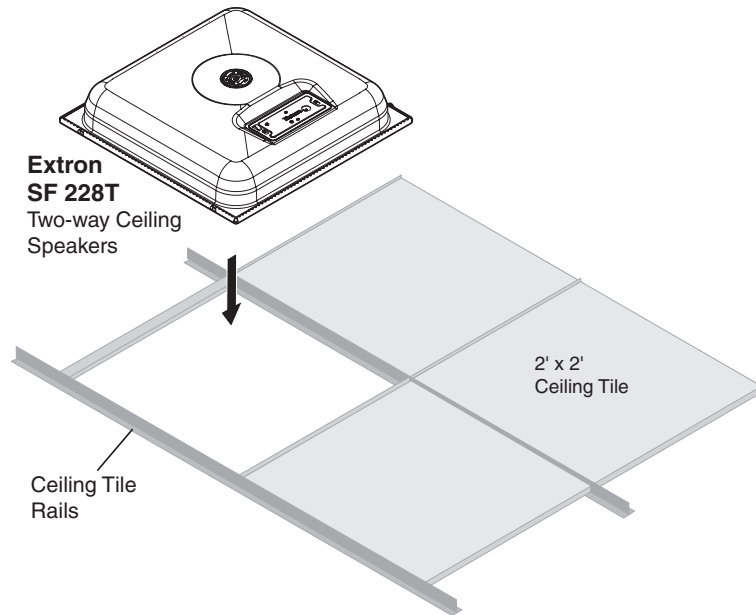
2 Feet x 2 Feet Ceiling Tile Installation
